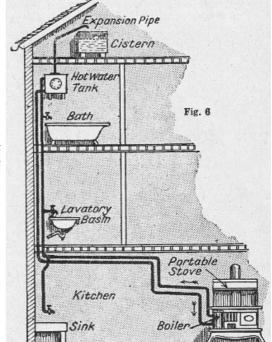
Tank system of hot water supply fitted to a portable caoking stove with side boiler.
